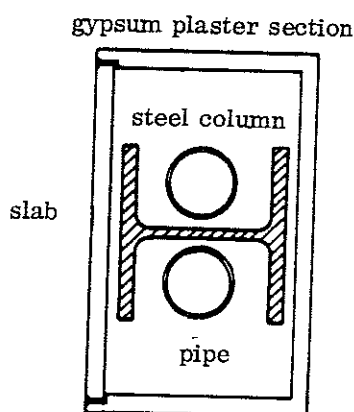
b. Freestanding column with fire insulation in the form of prefabricated gypsum plaster sections
